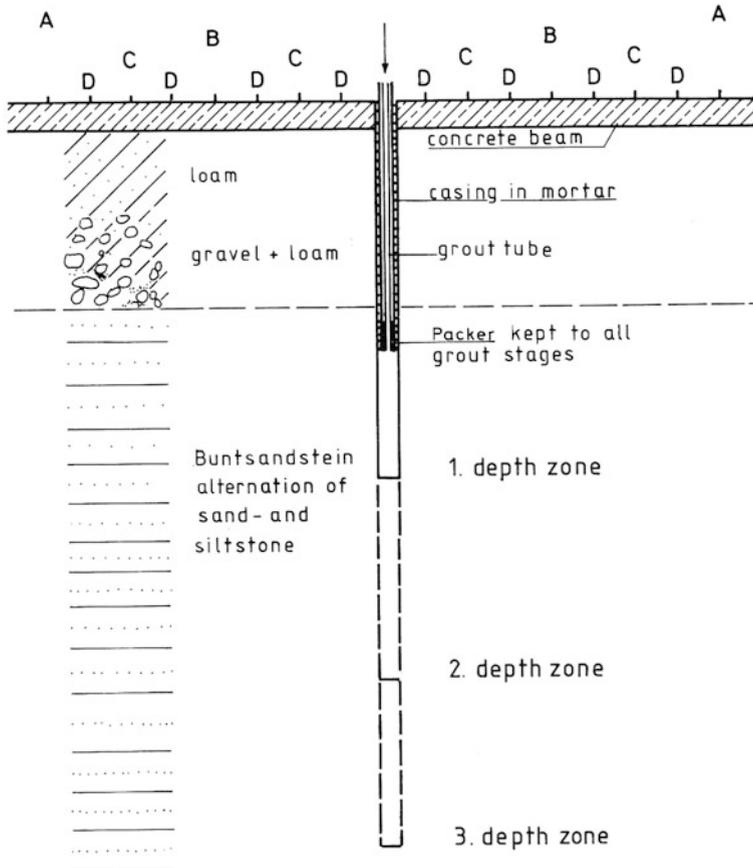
Twiste Dam, grouting scheme, with packer fixed inside casing
